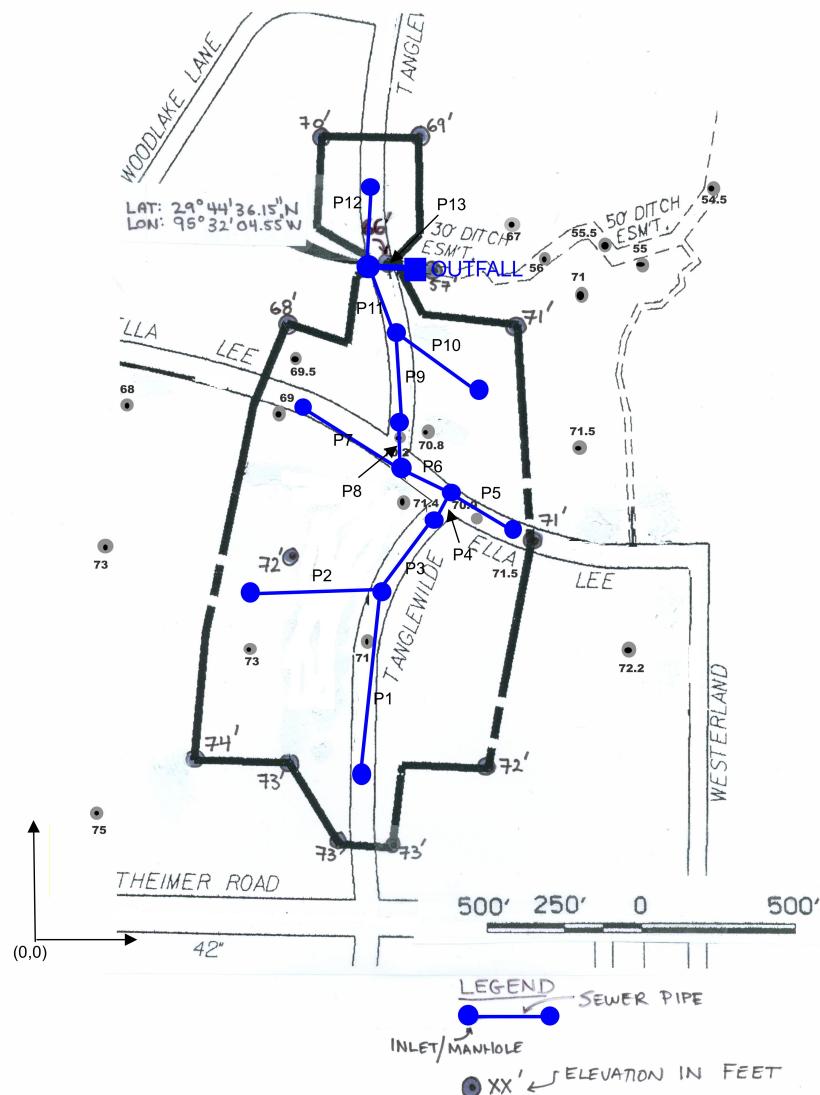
Tanglewilde Drive Storm Drain Inlet and Pipe Alignments
